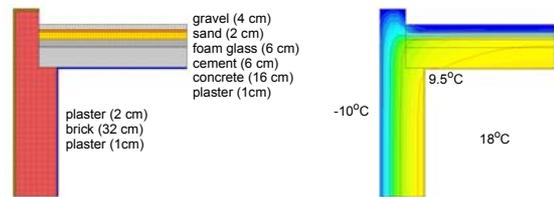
Cross-section and typical temperature profile for corner solution with brick exterior wall.
